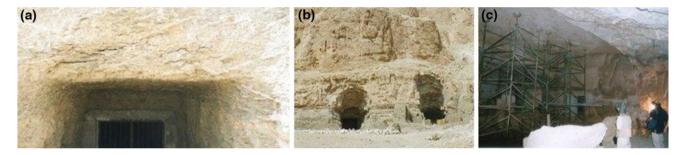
Progress of opening excavation techniques in old Egypt: a shale, b roof limestone and sidewall shale, c limestone (after Aydan and Genis 2004; Hamada et al. 2004)
